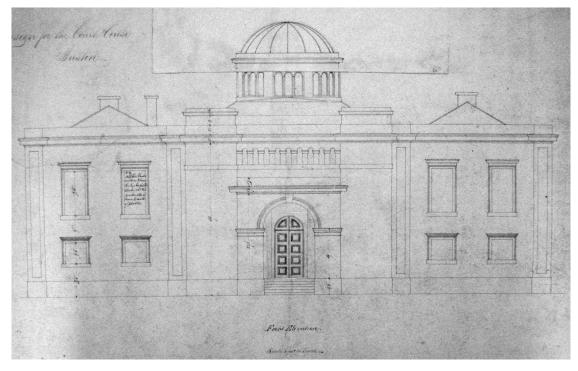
Proposed front elevation for Preston Sessions House, Rickman and Hutchinson, 1825 (LRO QSV/12)
